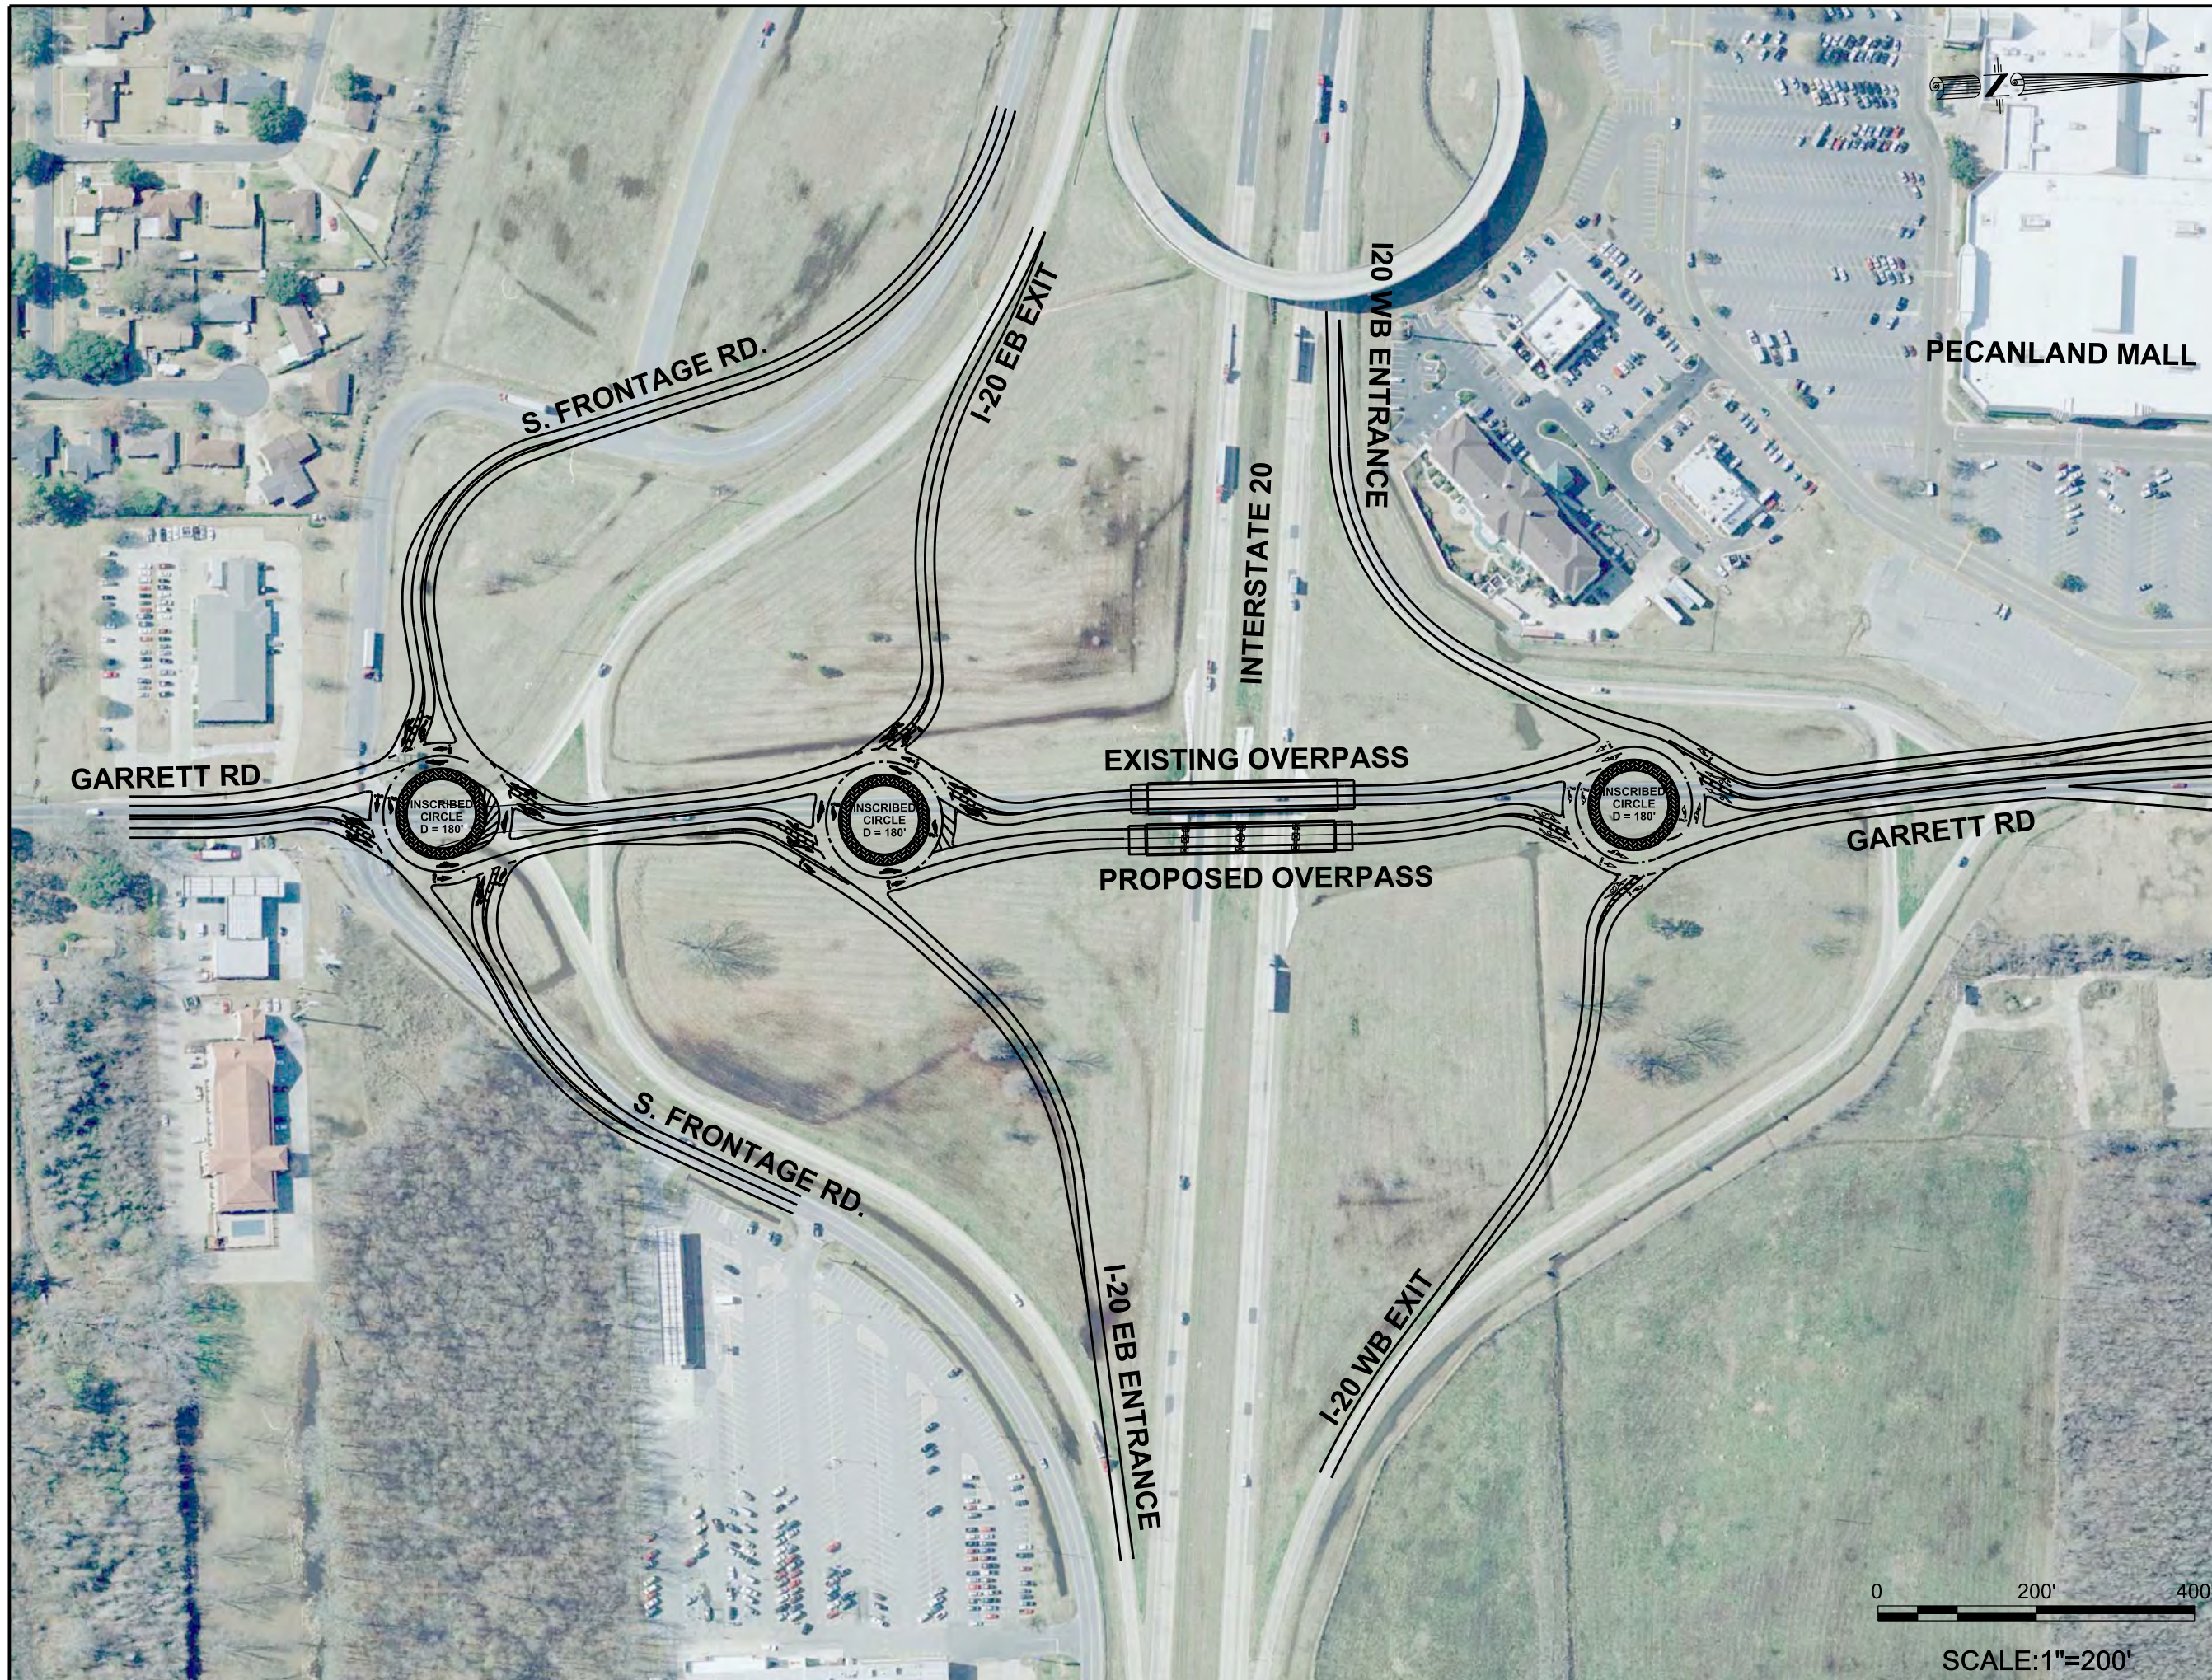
illustrates the conceptual layout of the proposed improvements for the Garrett Road and I-20 interchange.
